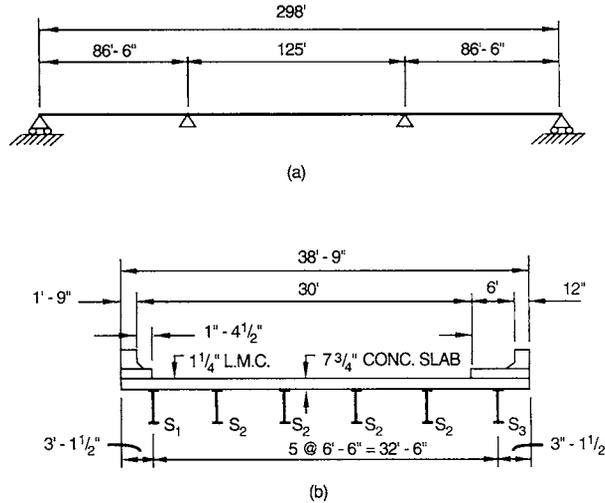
(a) Spans of a continuous highway bridge. (b) Typical cross section of bridge.
